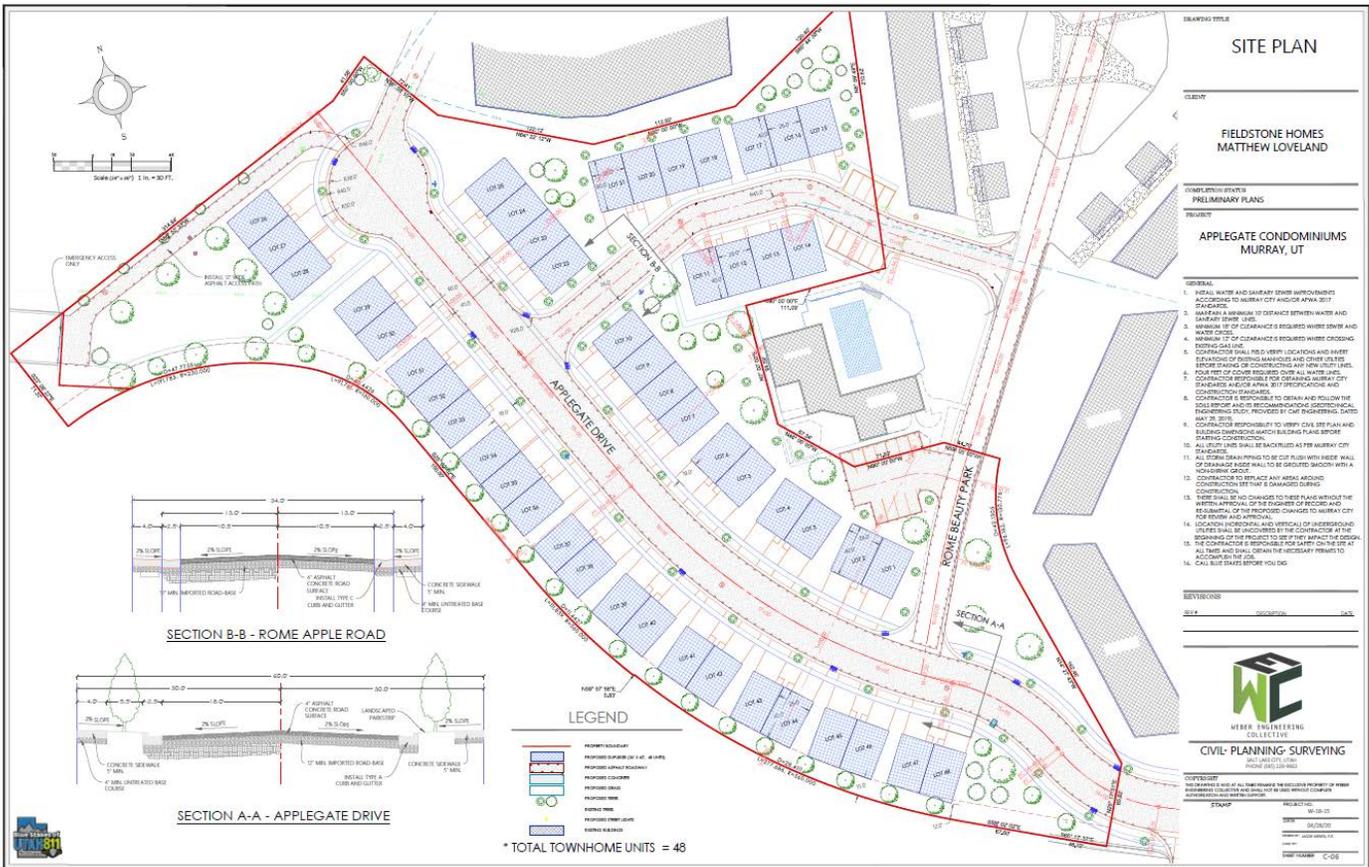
Proposed Applegate Townhomes PUD Subdivision
